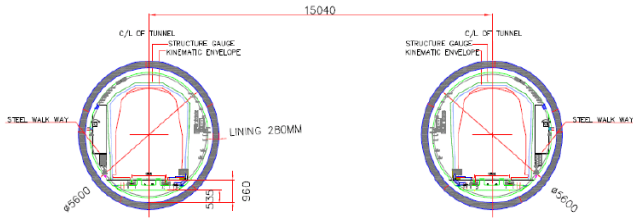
Cross-section of Bangalore Metro Underground Tunnel.
